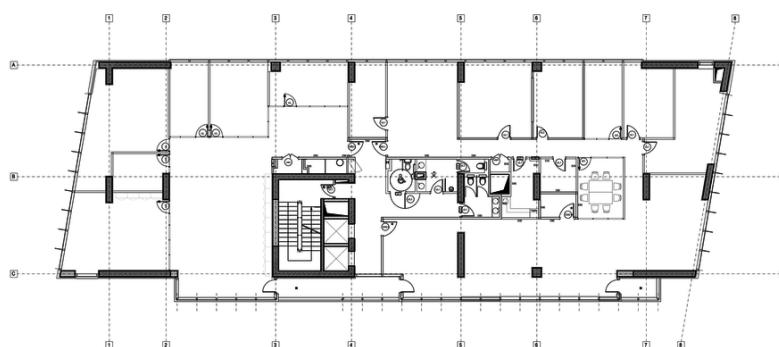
CSDA Siriului. Current floor plan © Alexandru Calin
